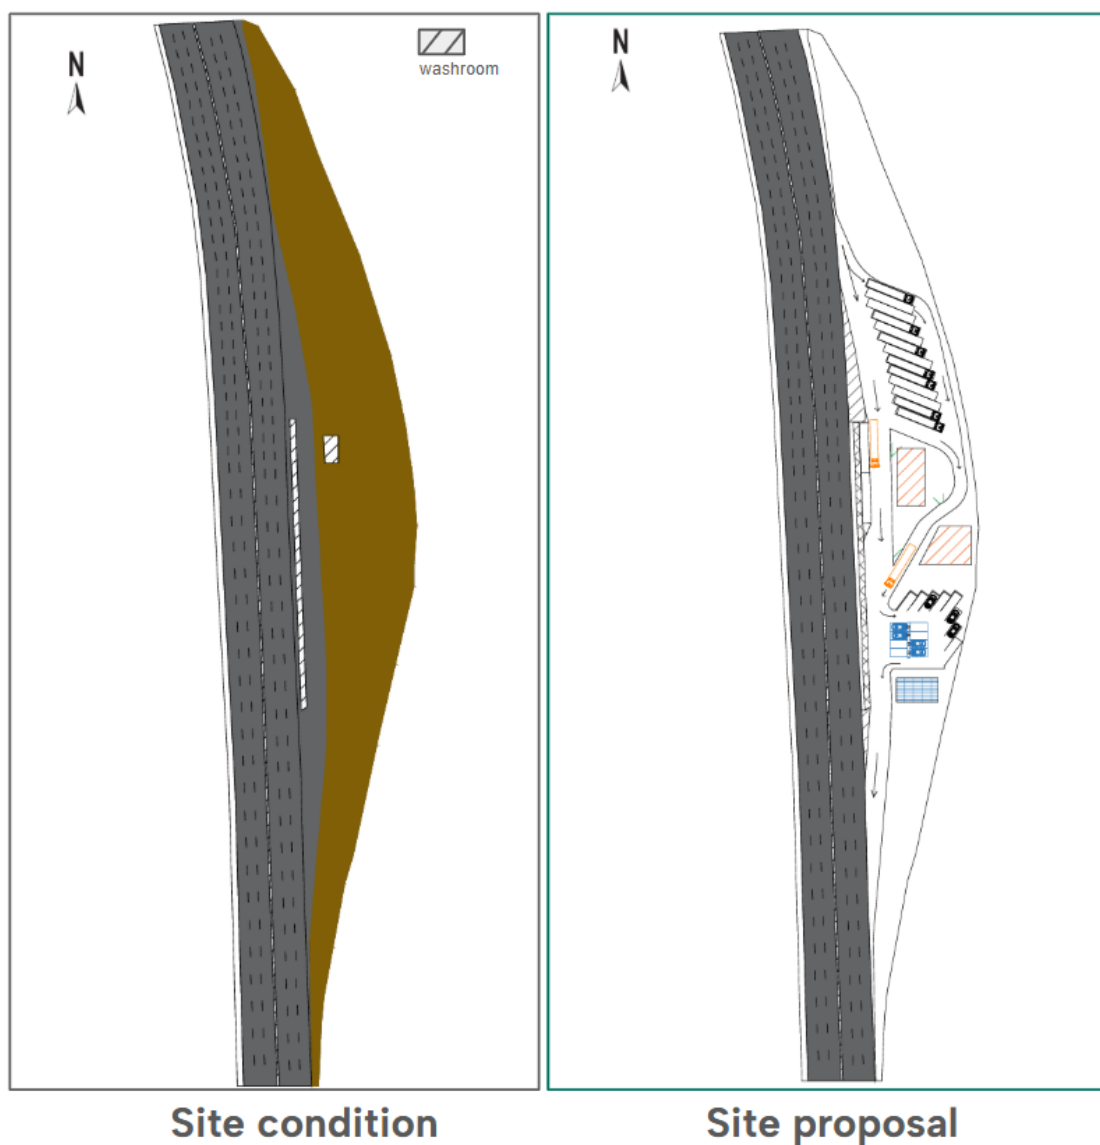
Site Proposal Plan of Kohinoor, Malappura
